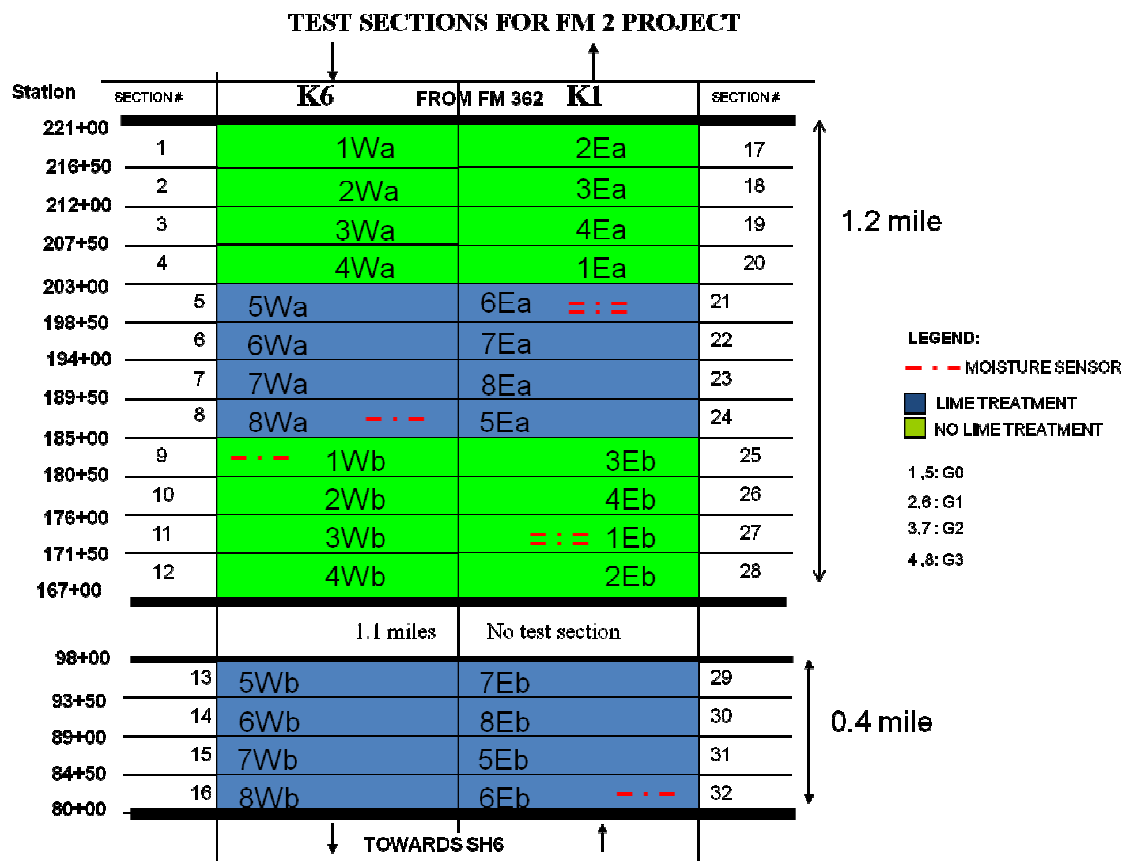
Schematic layout of the test section as per station number on FM 2 site
